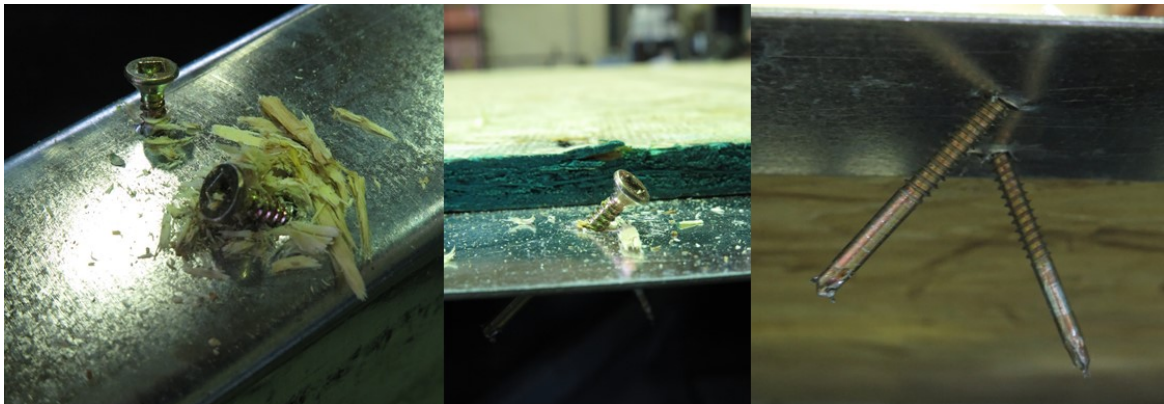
Tilting of Sheathing Fasteners Due to Shear Forces
